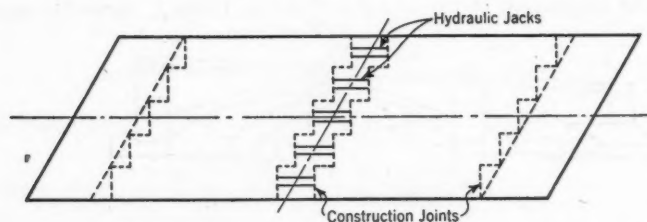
PLAN SHOWING HYDRAULIC JACKS METHOD OF POURING SKEWED ARCH
